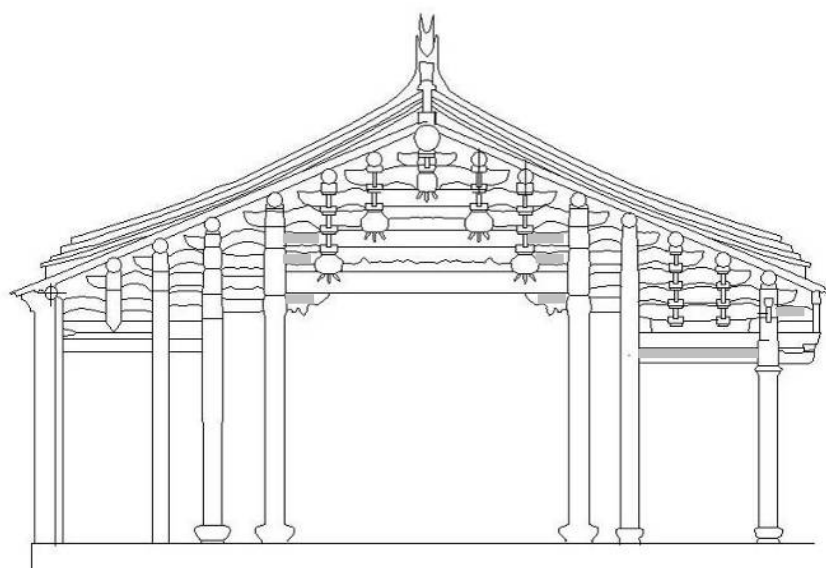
Damaged elements of Dou-Shan main hall timber left frame
